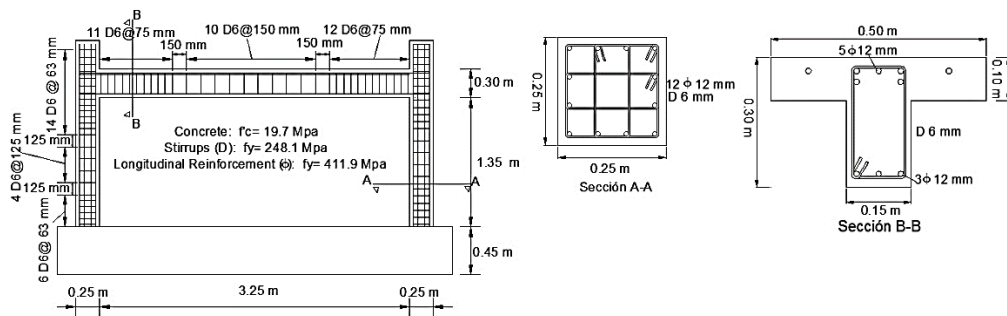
Reinforcing details and dimensions of frame corresponding to six story building
